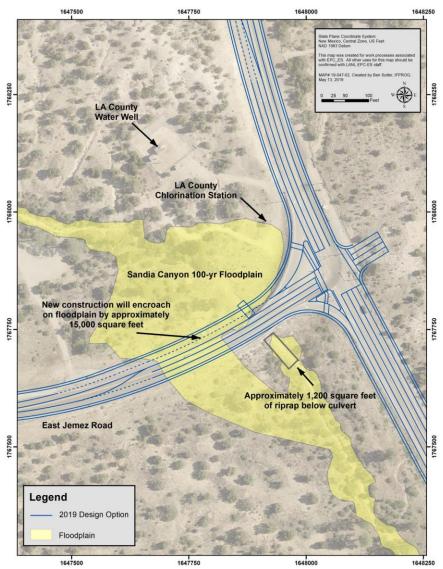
Aerial photo showing current intersection configuration with new configuration overlay and 100-yr floodplain.
